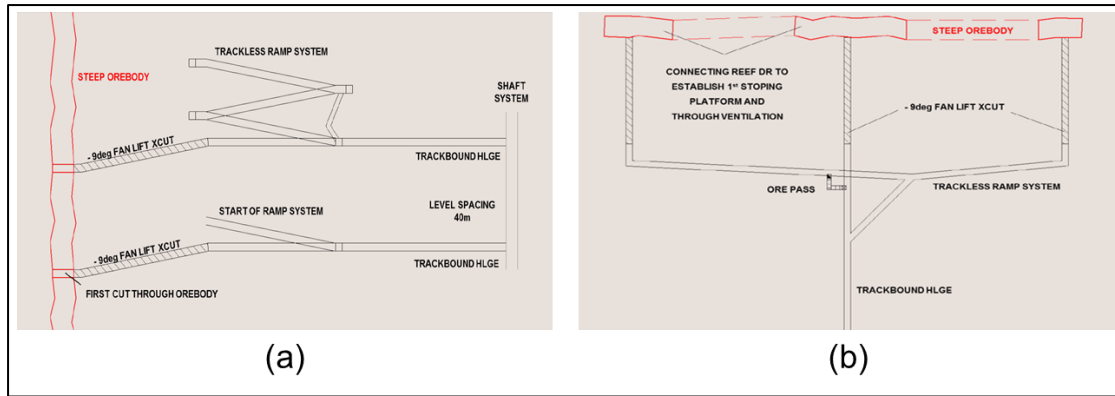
(a) Cross-section and (b) plan view of mechanised cut and fill mining.
